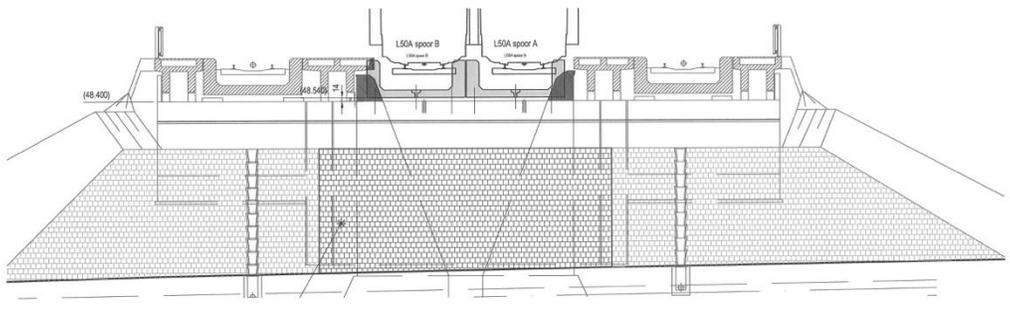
Cross-section of the Herdebeekstraat bridge, abutment closest to Brussels.
